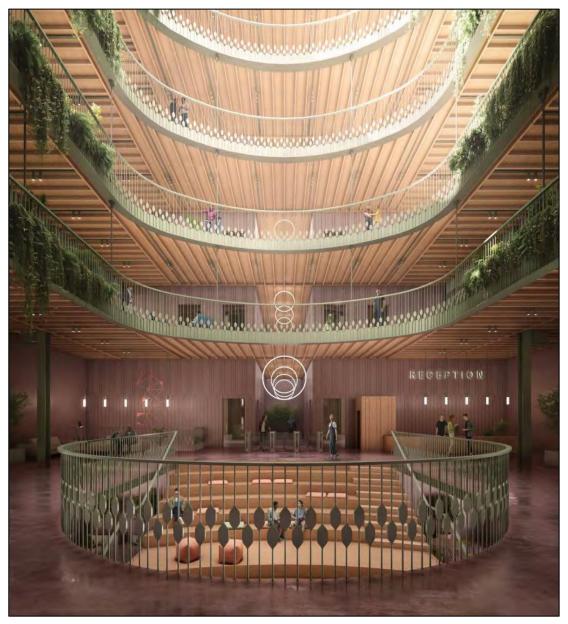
Indicative view of the internal atrium to the centre of the building, at ground floor level
